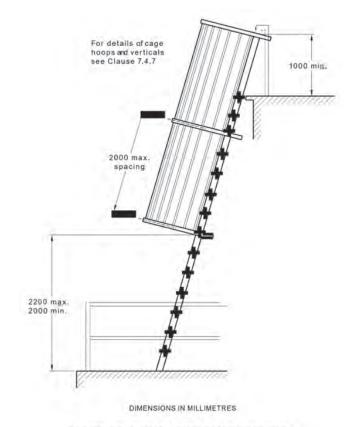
TYPICAL LADDER CAGE DIMENSIONS
